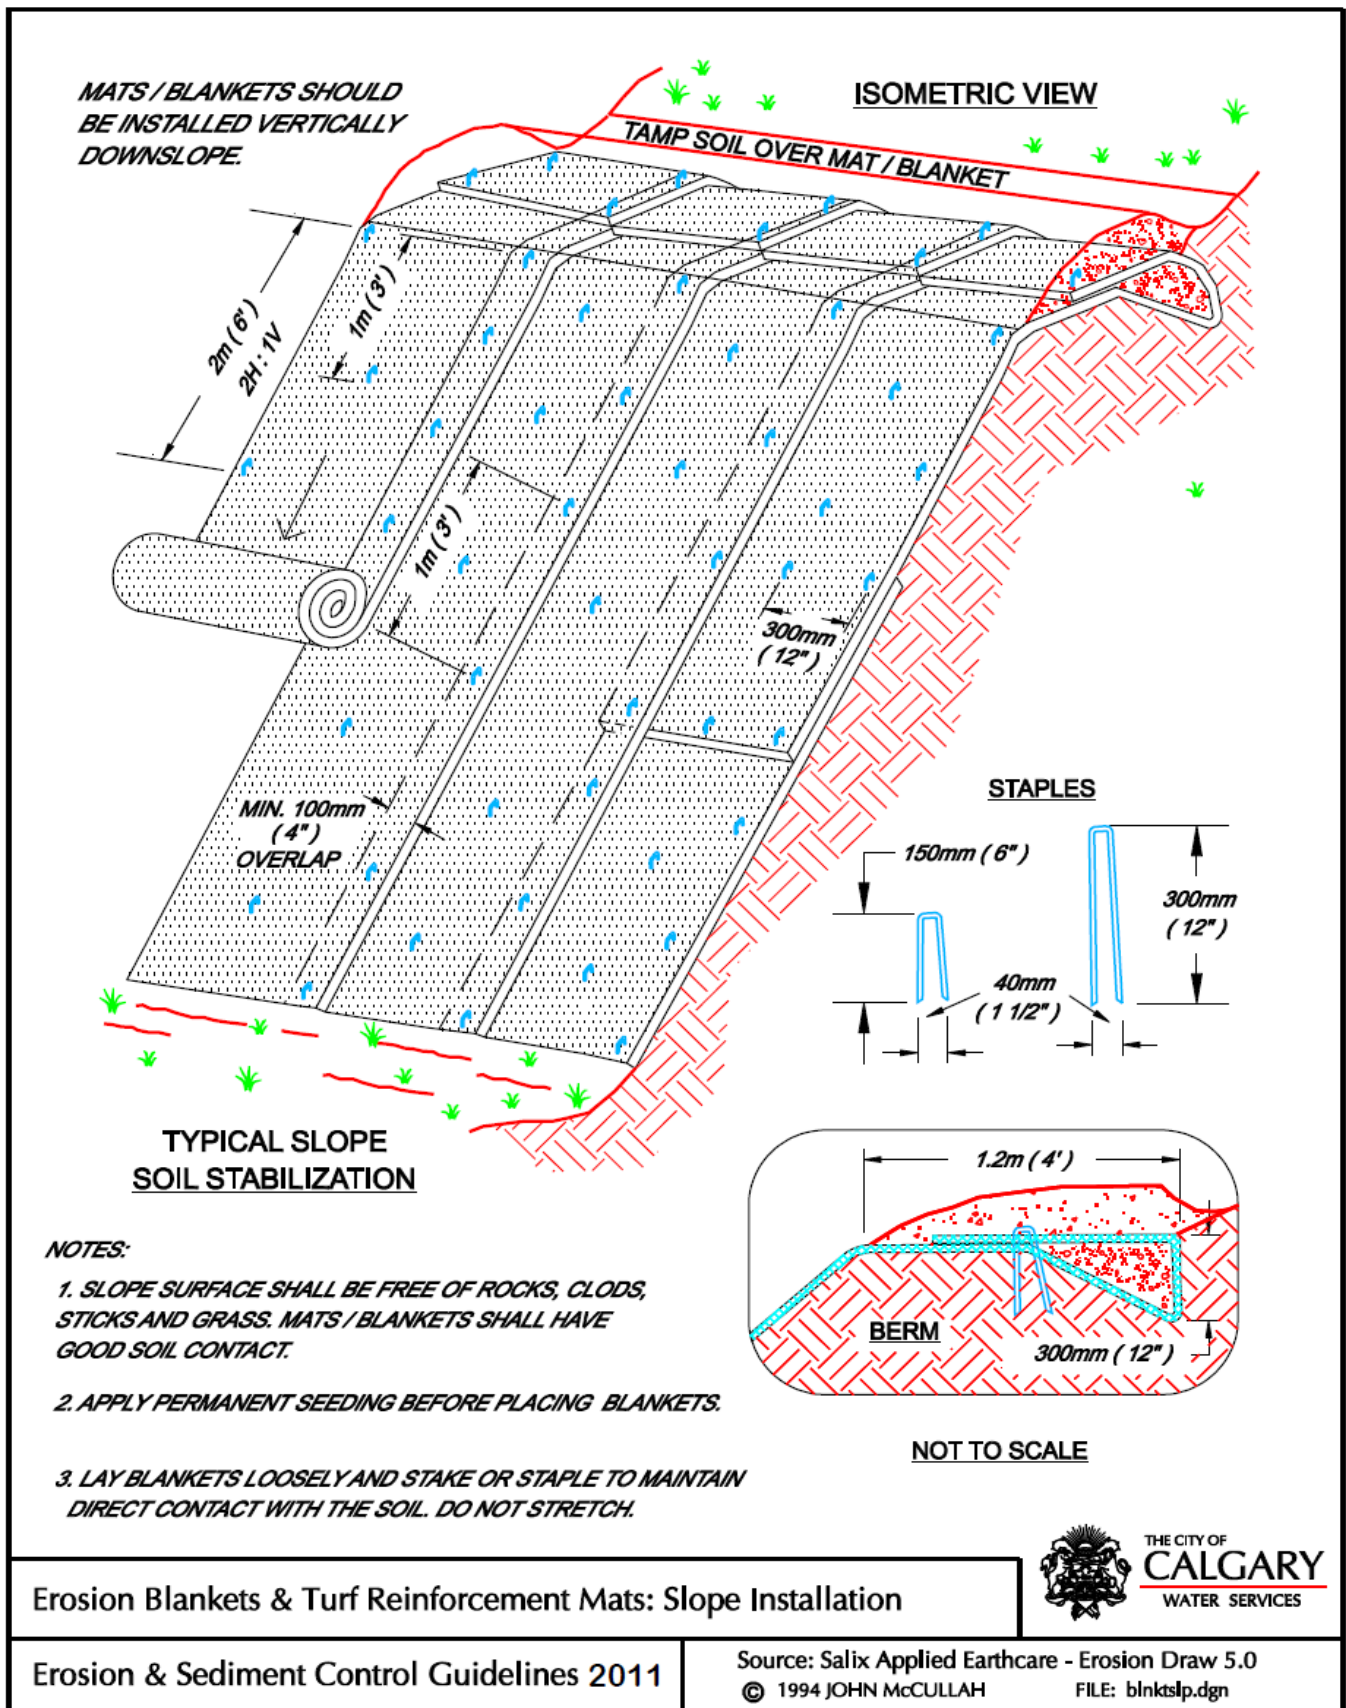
Typical Installation Detail for RECPs on Slopes
